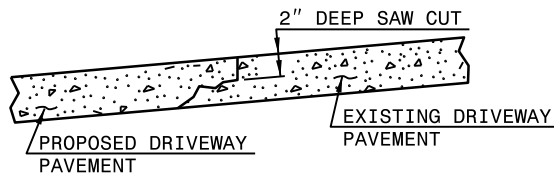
DETAILS SHOWING JOINTS IN CONCRETE SIDEWALK
